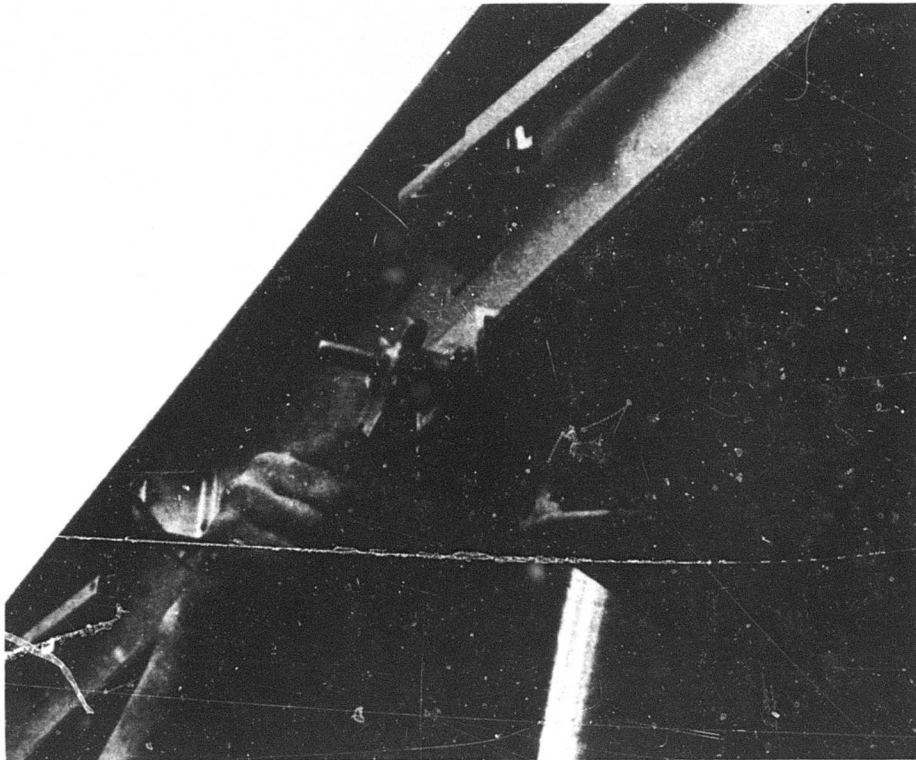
Joint of Diagonal Truss to Main Arch Beam
